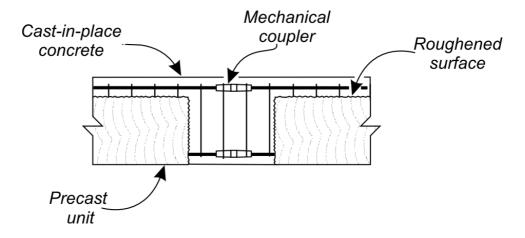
Beam-to-beam connection through mechanical couplers
